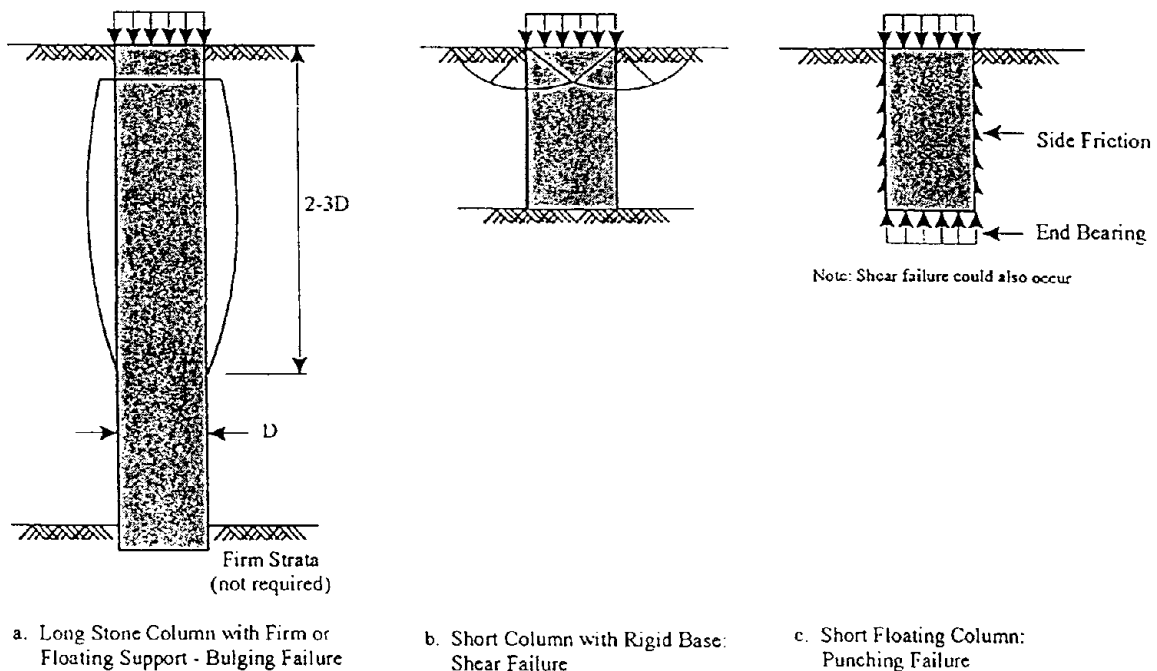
Failure modes of a single stone column in a homogenous soft layer.
